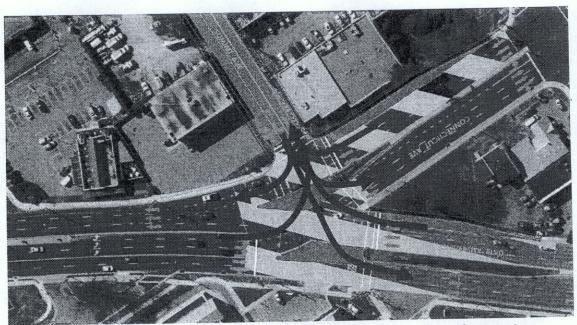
Summit Avenue Extension Connection at Connecticut Avenue/University Boulevard Intersection
